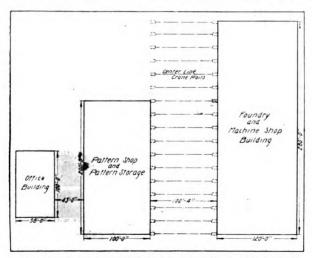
ARRANGEMENT OF BUILDINGS, AMERICAN SHIP BUILDING CO., CLEVELAND
